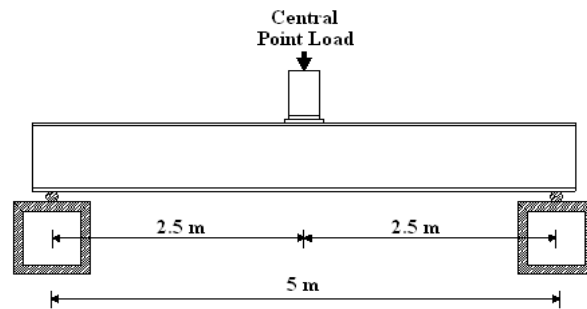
Typical cross section of beam with 5-m for NPI-200 and NPI-240 Sections
